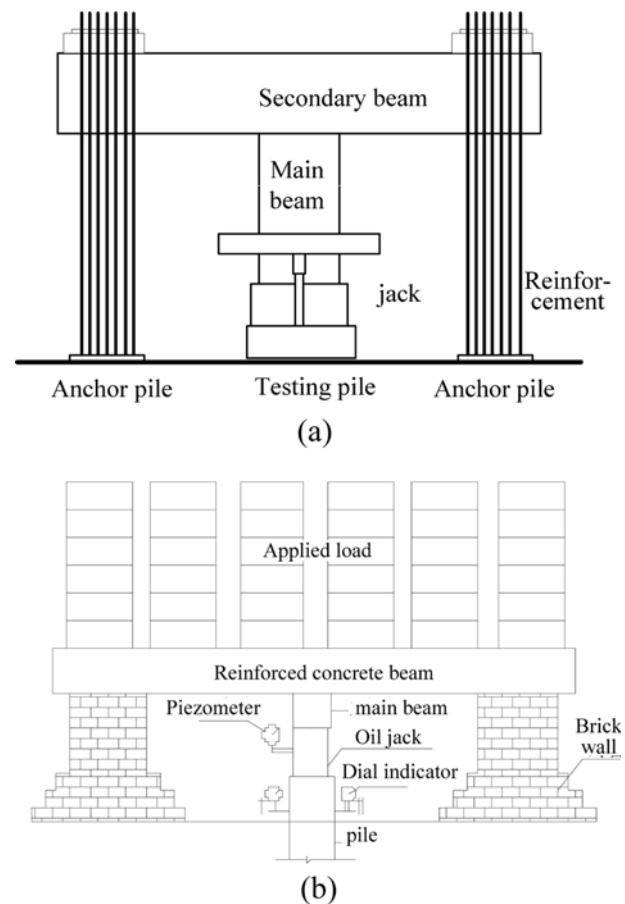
View of Reaction System: (a) Anchor-pile System, (b) Concrete-block System
